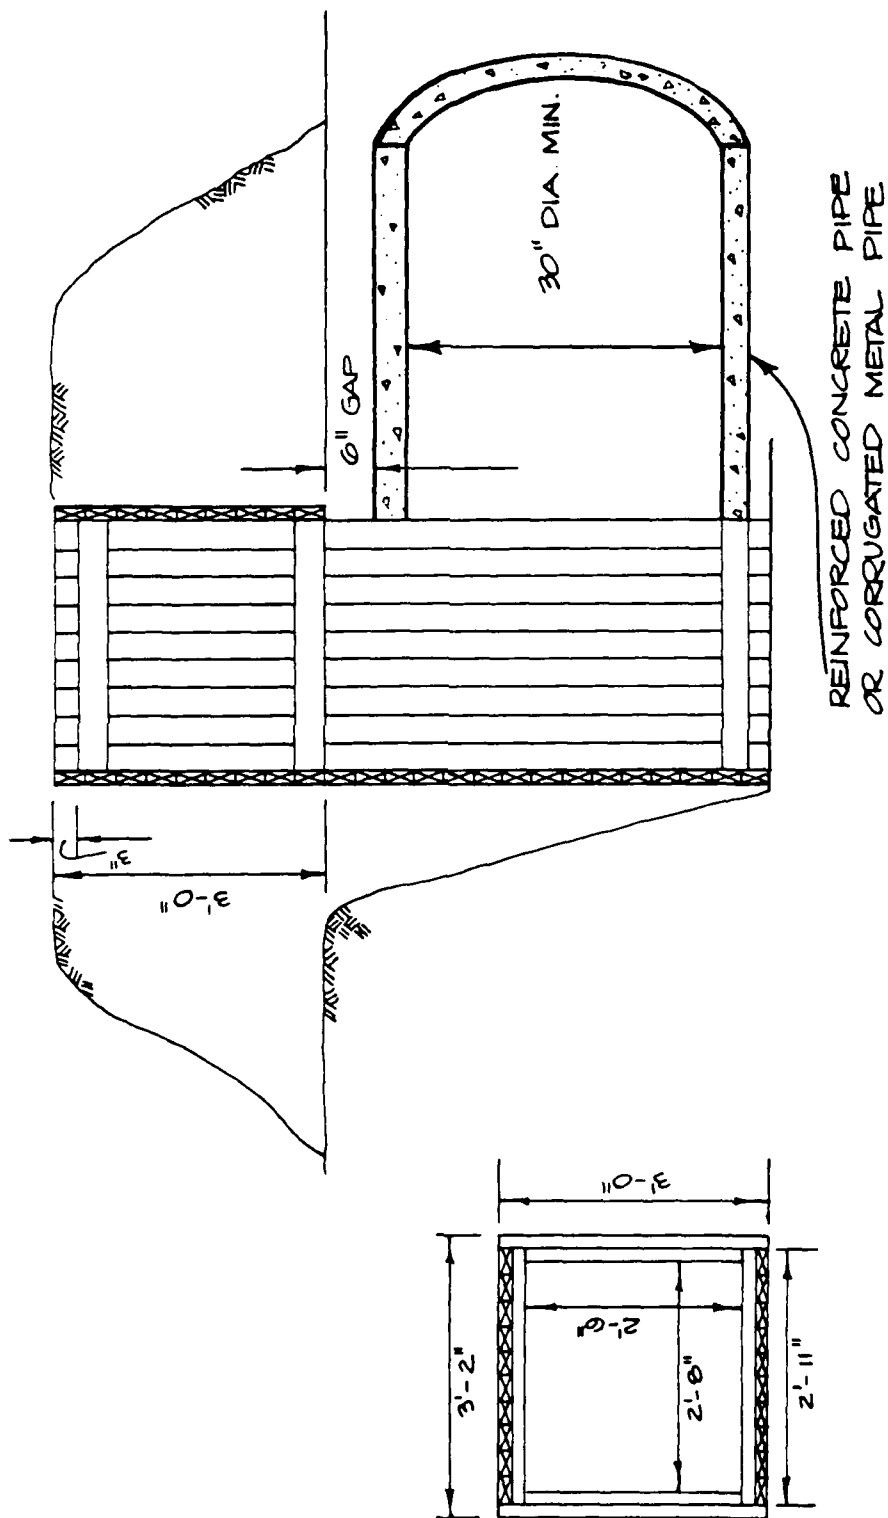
Typical Entryway to Buried Shelter With Culvert Shown.
